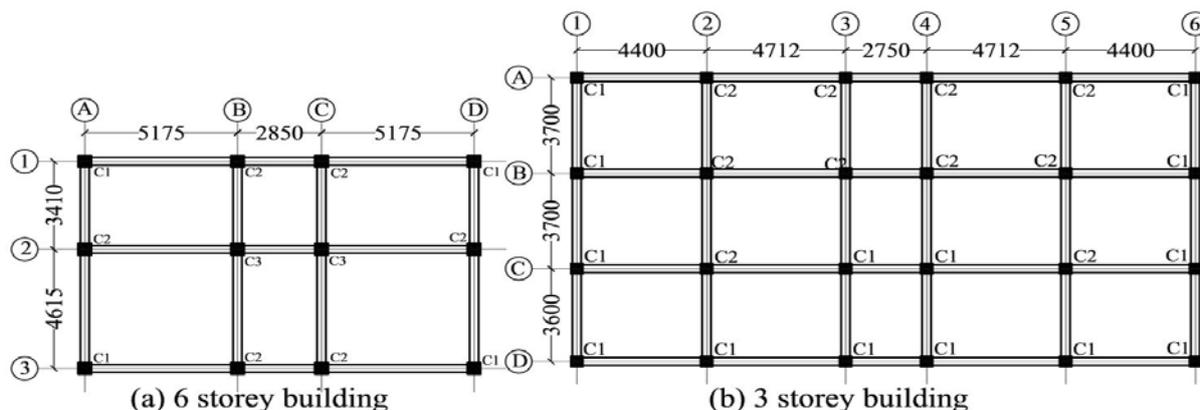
(a) Plan of ‘6 storey’ buildings; (b) Plan of ‘3 storey new’ and ‘3 storey old’ buildings.
